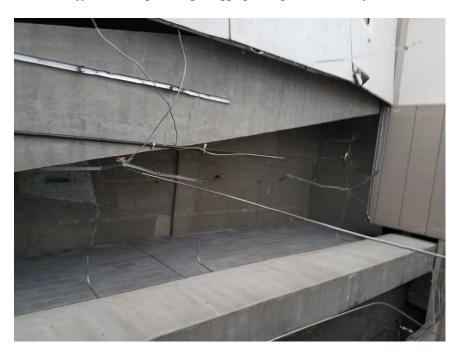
Typical existing framing – sagging ceiling at North Ramp
